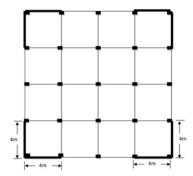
TYPEI (SHEAR WALL AT CORNERS)
